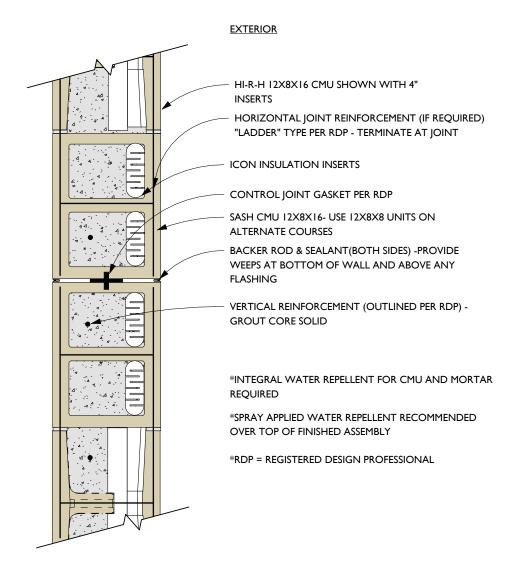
HI-R-H - Piers Control Joints and Jamb - HI-R-H Jamb Unit Hooked Reinforcement
